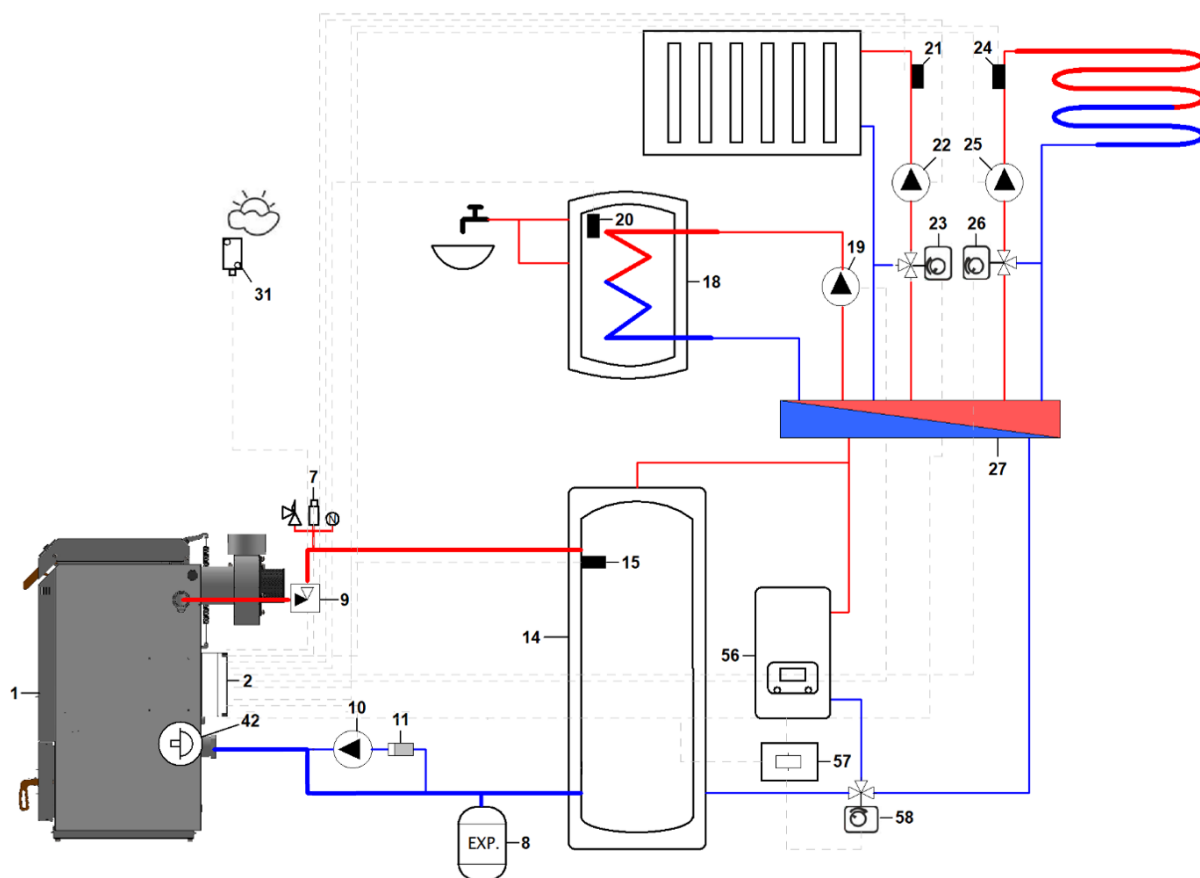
Hydraulic connection with a backup boiler (56), relay (57), and switching valve (58)
